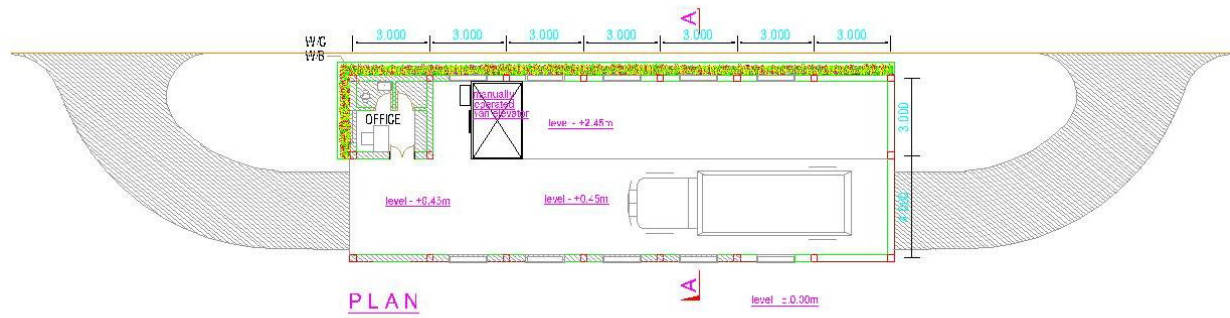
STS – 4 Rashik Composting Plant Preliminary Plan
